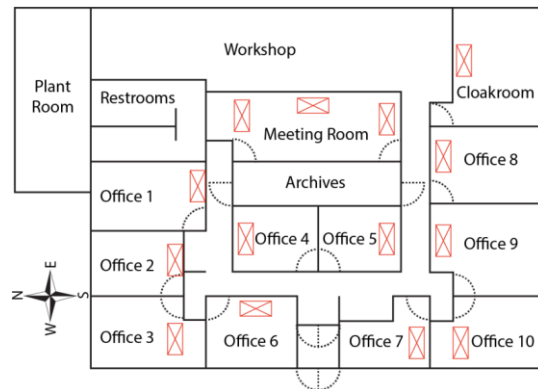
Plan view of the building modelled with FCU locations (red crossed boxes).
